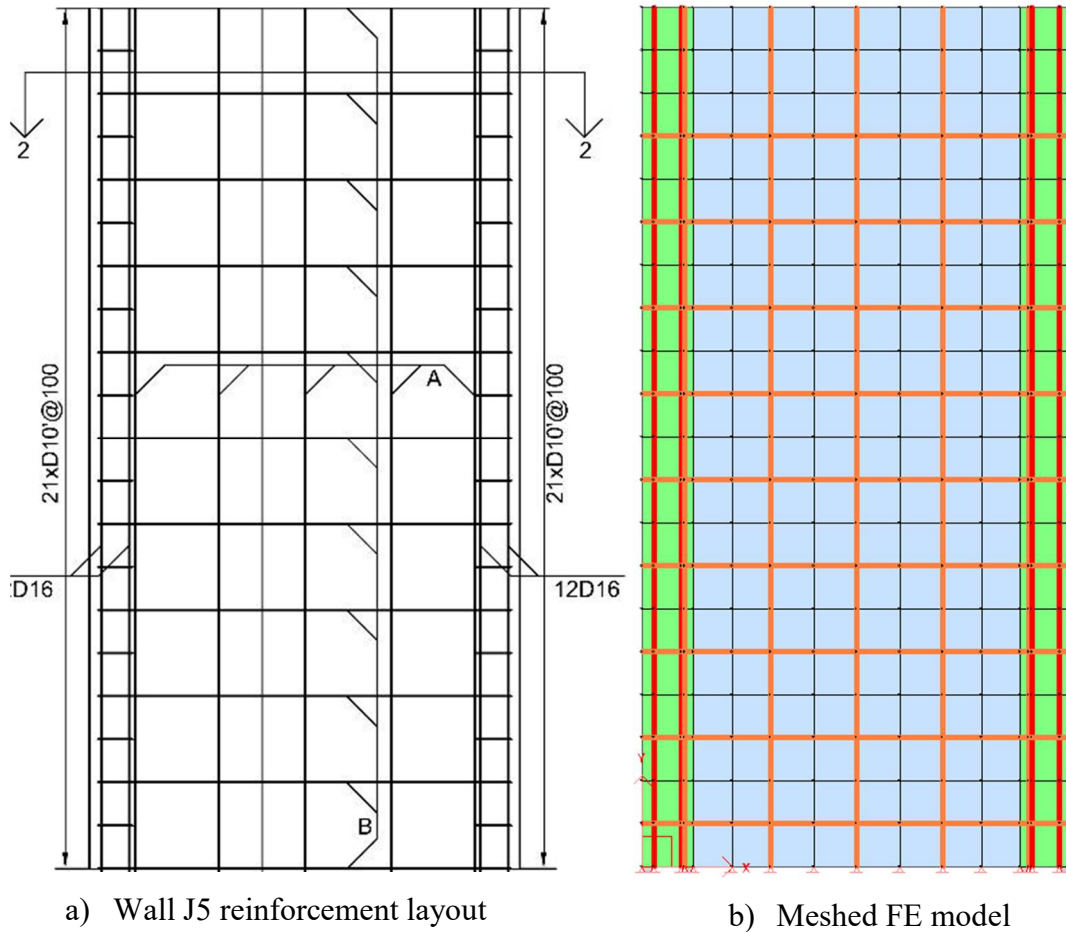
Details of wall J5 (Chandra, 2017)
